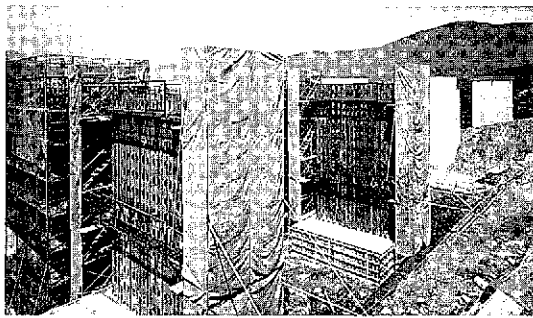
Steel-element-concrete composite pier under test construction at Irita Bridge
